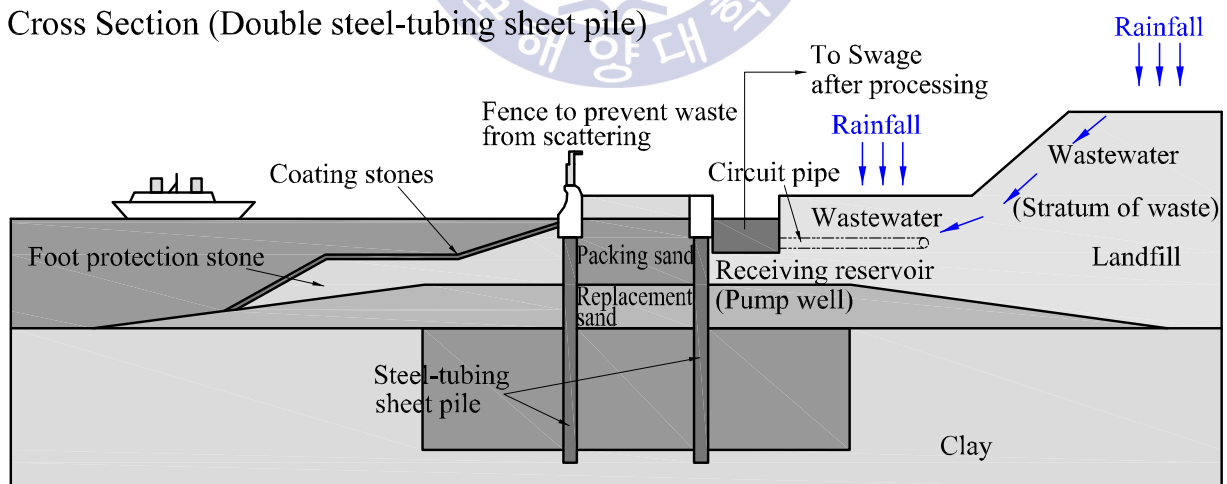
Outer protection structure (Tokyo Bay offshore waste landfill site)
